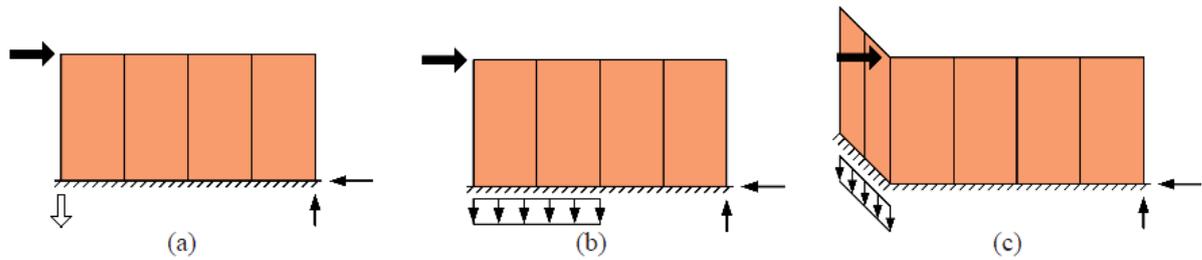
Different methods to vertically anchor a horizontal loaded sheeted timber stud wall. (a) Concentrated anchor at leading stud. (b) Distributed anchor by the sole plate. (c) Anchoring via transverse walls. (Källsner & Girhammar 2008)
